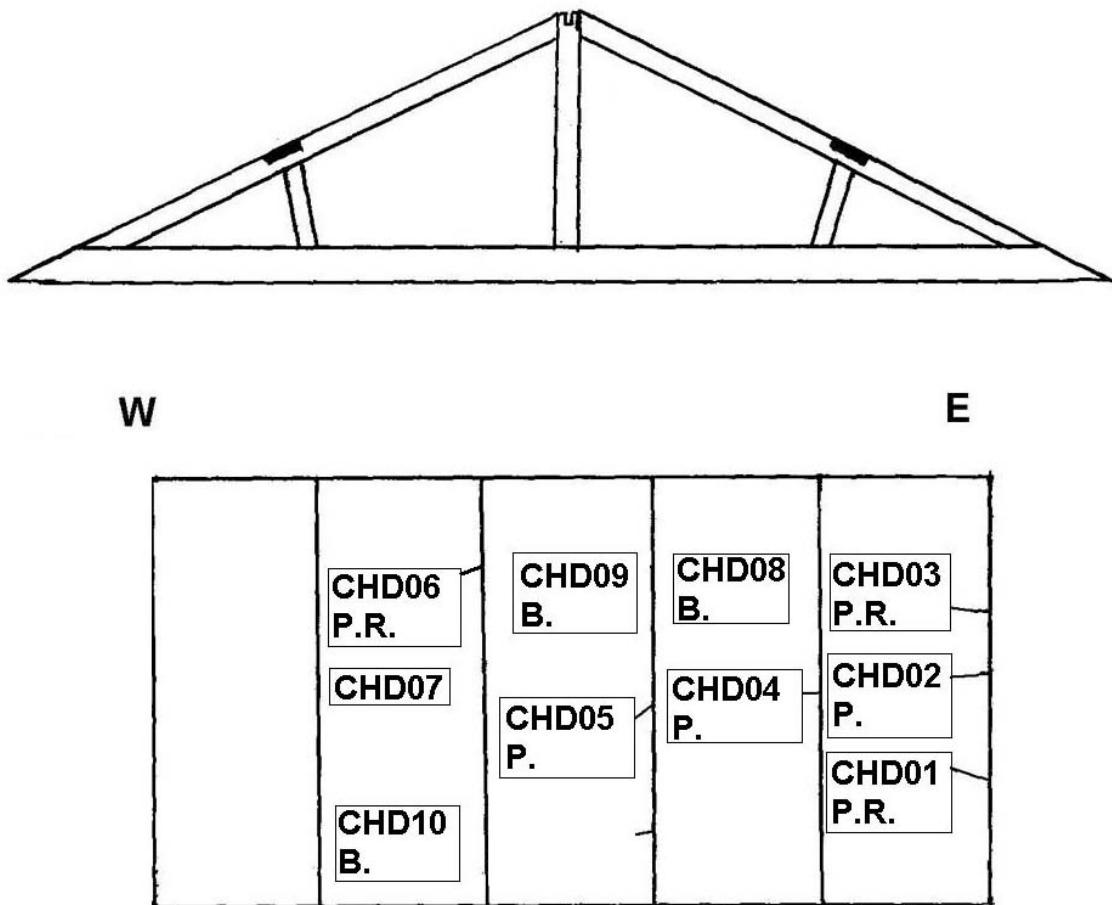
Sketch of truss form and plan of roof showing approximate positions of the timbers sampled. P.R. = principal rafter; P. = central post; B. = ceiling board
